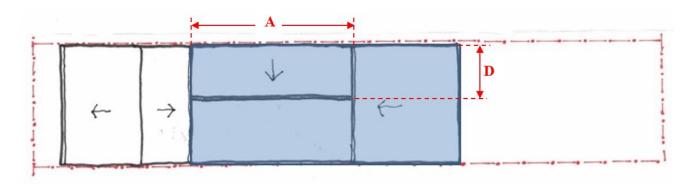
Plan view of an indicative lot in Paddington, illustrating the principal building form, linking structure and pavilion.
